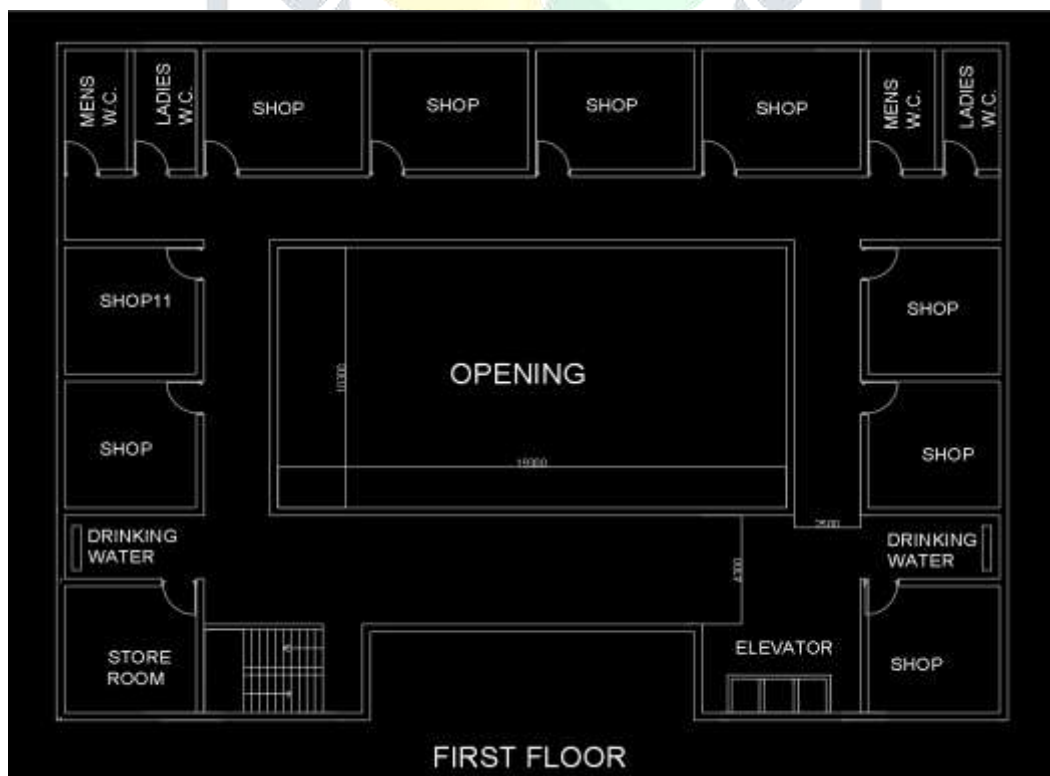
Plan of 1st 2nd 3rd 4th 5th 6th 7th 8th floor Building (all dimensions in mm)
